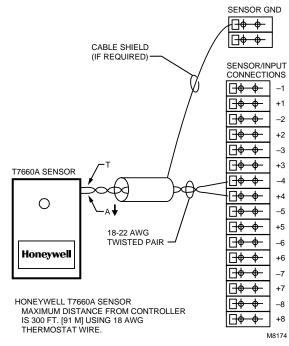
Typical T7660B Space Temperature Sensor wiring.
